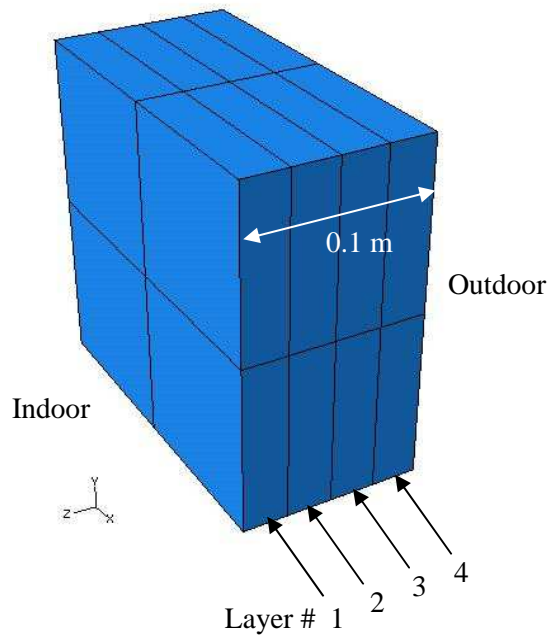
Geometry of wall panel 0.2 m x 0.2 m x 0.1 m
